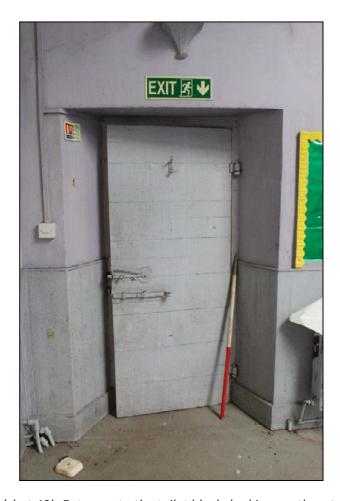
(shot 49): Entrance to the toilet block, looking southeast, scale 1m
